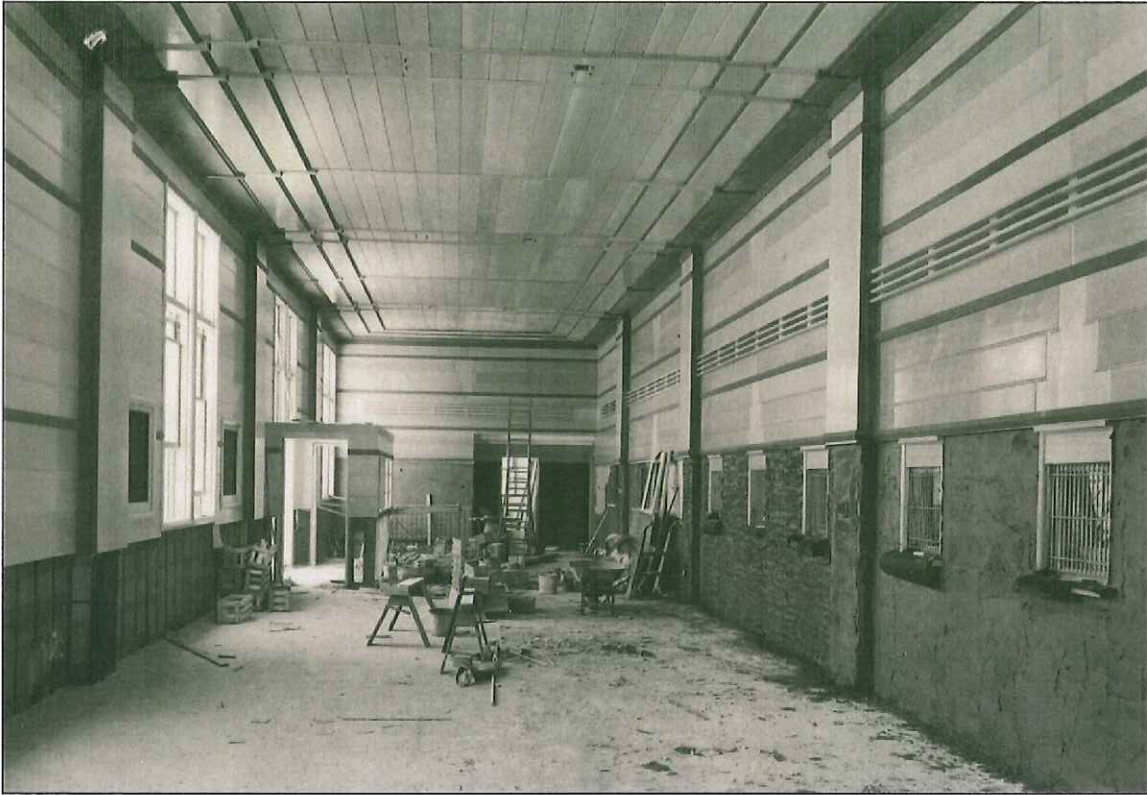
Lobby under construction, looking south, 1937 (Santa Monica History Museum)
